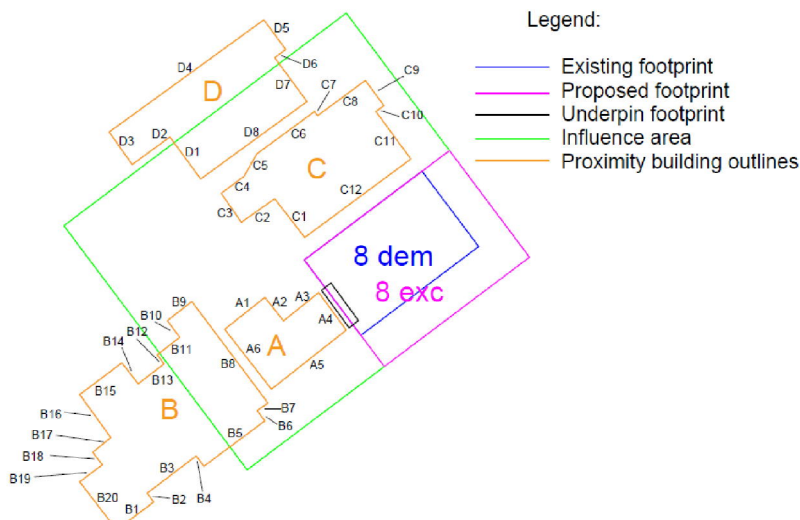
Simplified scheme and nomenclature for building façade/masonry wall elements (node/intersect reference numbers noted). Note dem: demolition & exc: excavation.
